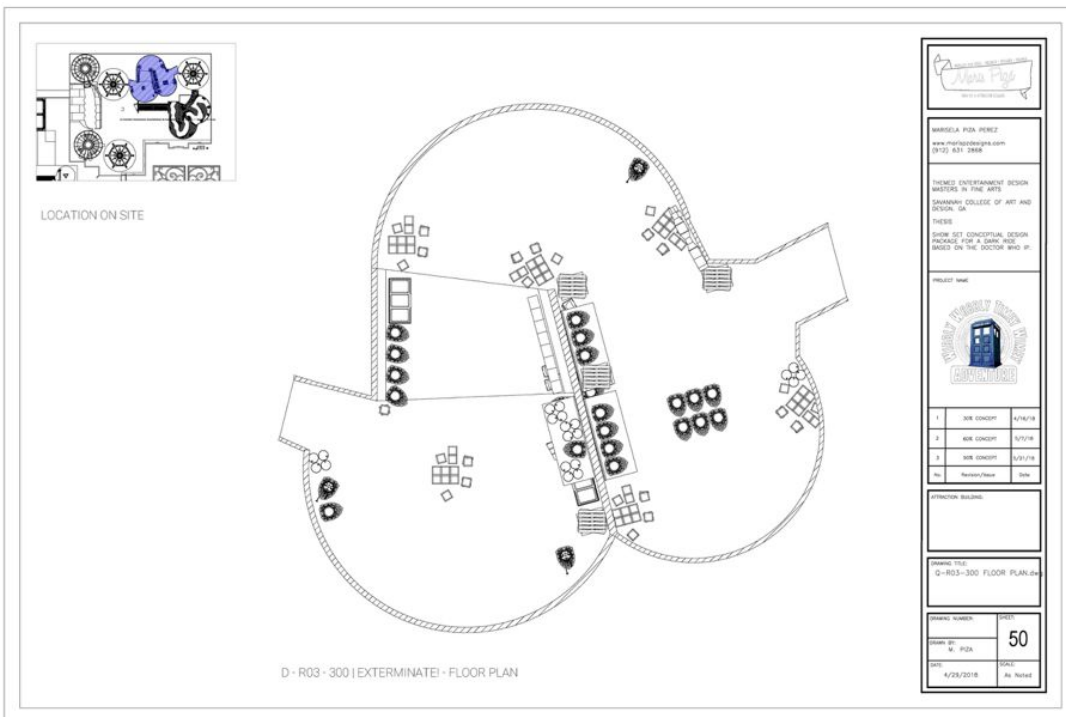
D-R03-300 | Exterminate! - Floor Plan
